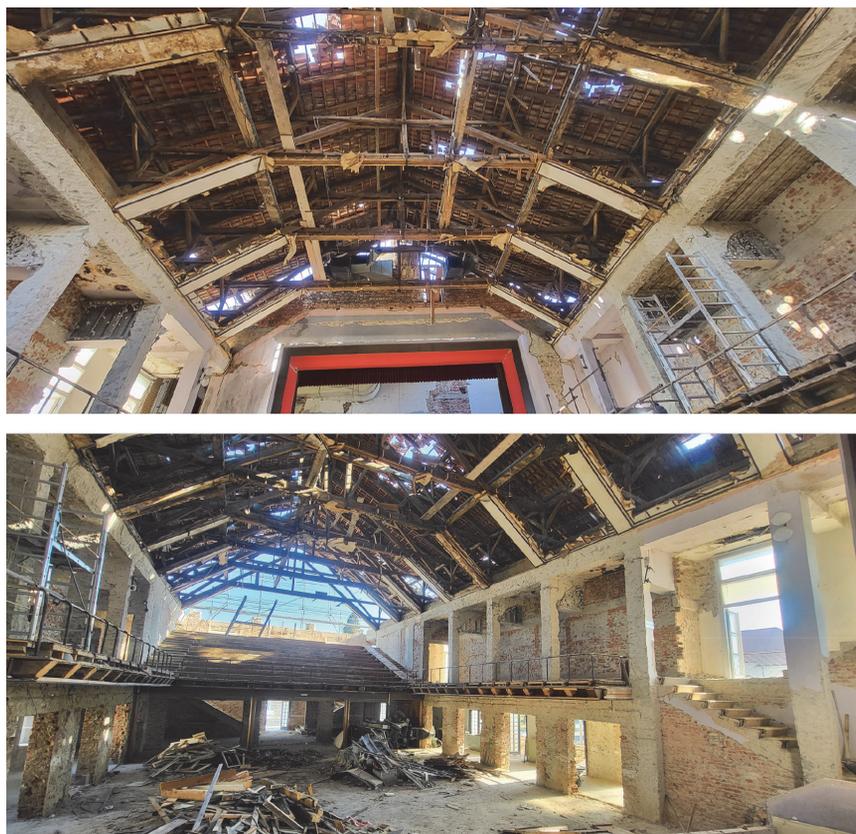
Images of the phase after removal of the cladding, when the structure is fully exposed [3]
